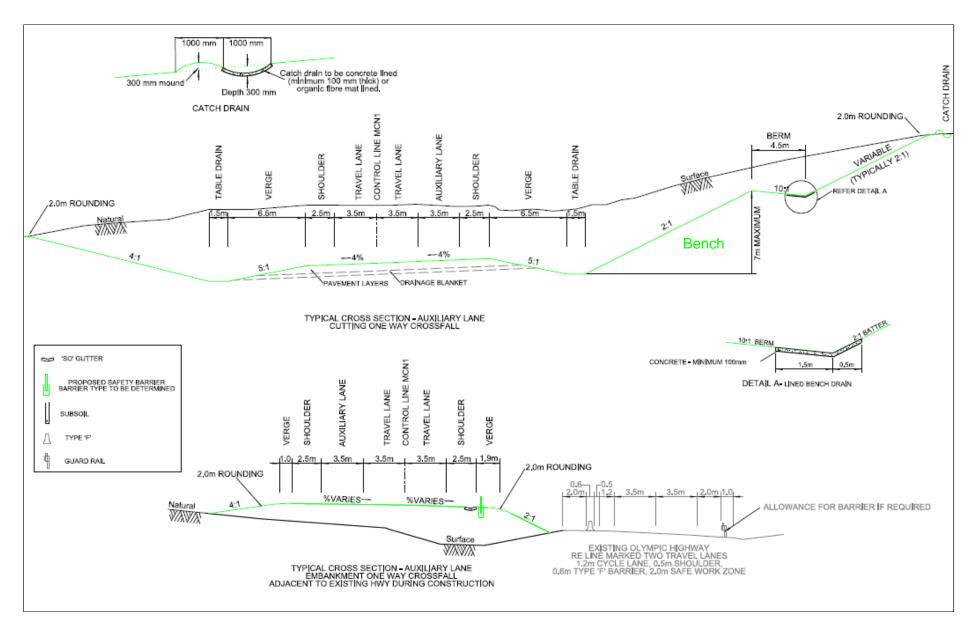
Typical cross section of proposed new Olympic Highway in cutting, including auxiliary lane
